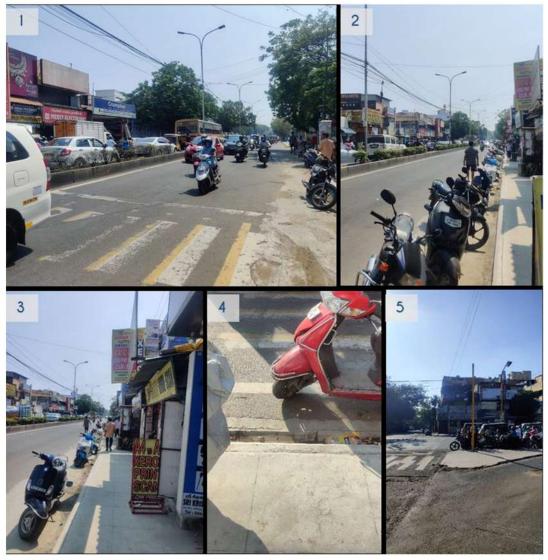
Present condition of undeveloped Street 1) Vehicular centric road, 2) Lack of designated parking, 3) Inadequate sidewalk & Encroachment, 4) Lack of universal accessibility, 5) Unorganized Intersection - Source: Author 2022
